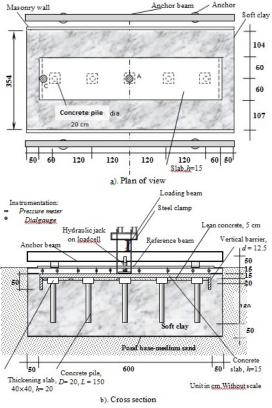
Schematic diagram of full-scale Nailed-slab with 1 pile row [2]
